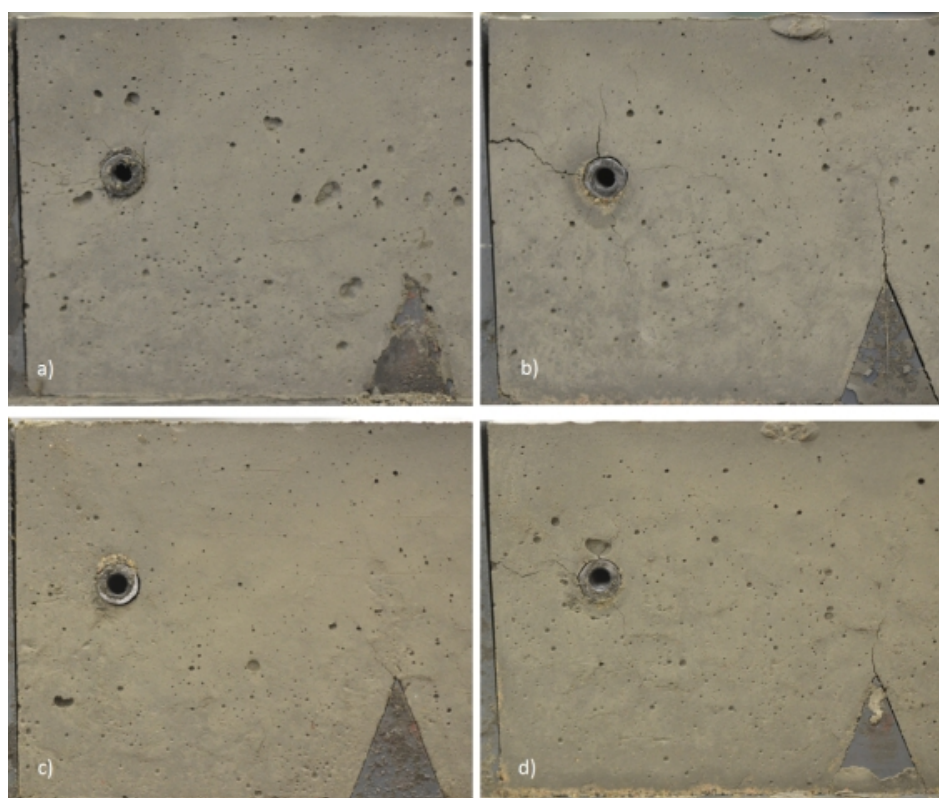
Images of the deformation and cracks at the left end restraints as captured from the side with the Perspex side panels removed at 5 hours after casting for Mix C3 at Climate E2 for: a) Shrinkage cracking mould with 64 mm bottom triangular insert at centre. b) Modified shrinkage cracking mould with no triangular inserts at centre. c) Modified shrinkage cracking mould with 10 mm steel bar with 20 mm concrete cover at centre. d) Modified shrinkage cracking mould with 10 mm steel bar with 40 mm concrete cover at centre.
